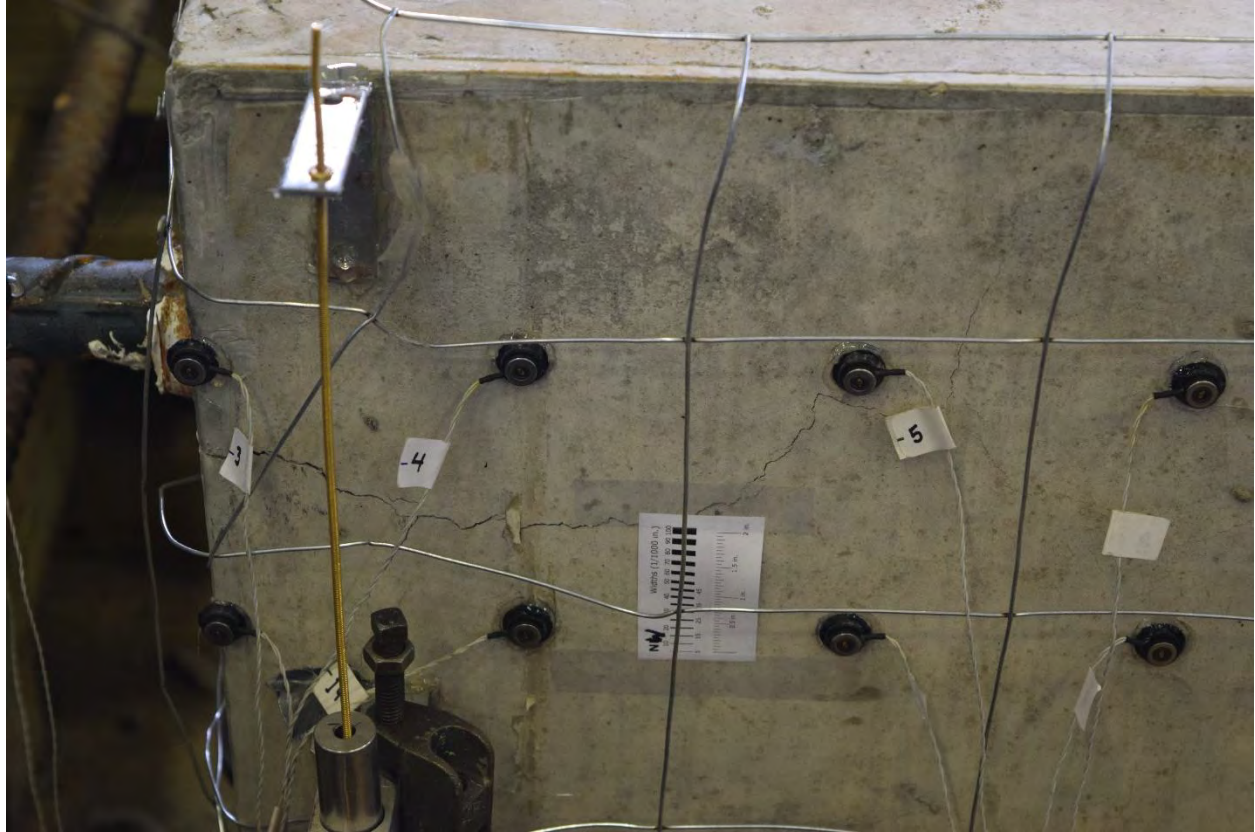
Test Photo Specimen D9, NW corner, 115 kips
